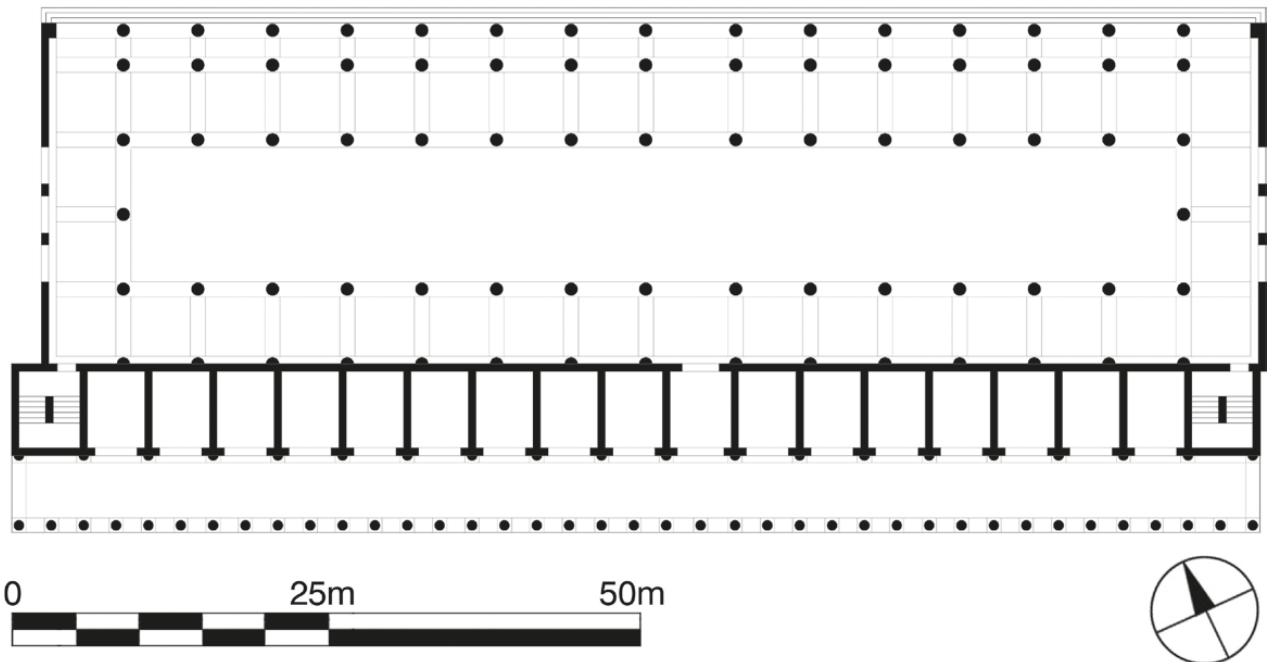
Basilica Fulvia, *ca.* 179, plan (John Burge)
